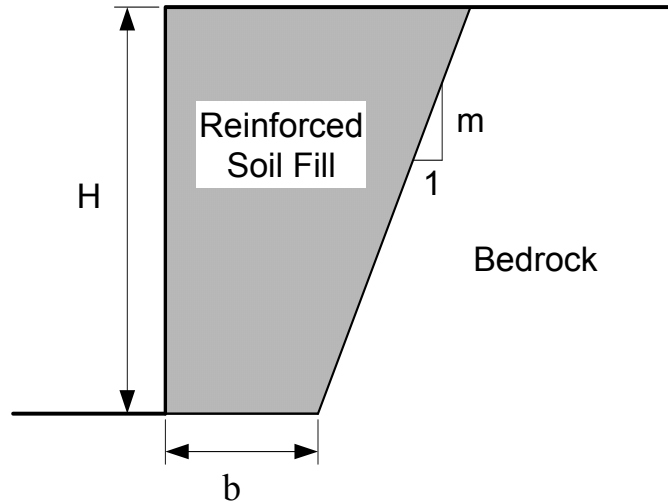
Example of wall aspect ratio defined as  $b/H$  for a wall placed in front of an existing sloped stable face
